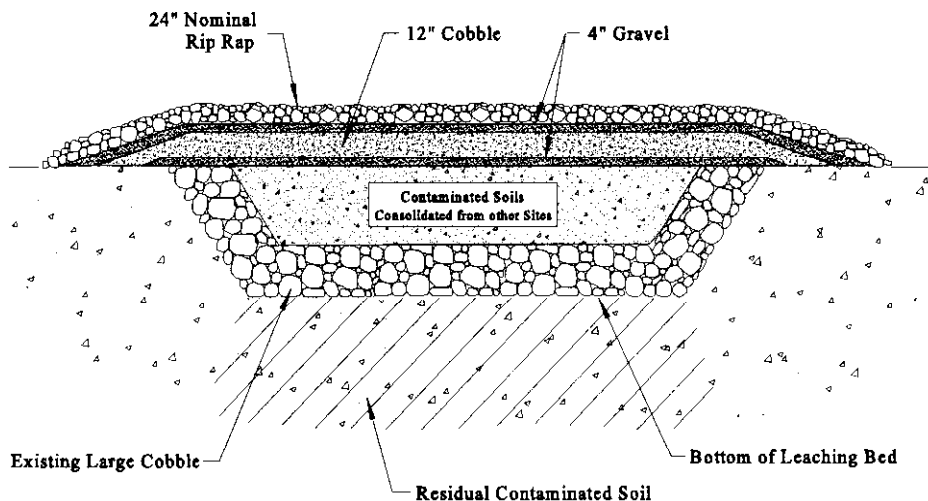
Cross-sectional View of Engineered Cover for Alternative 3a
